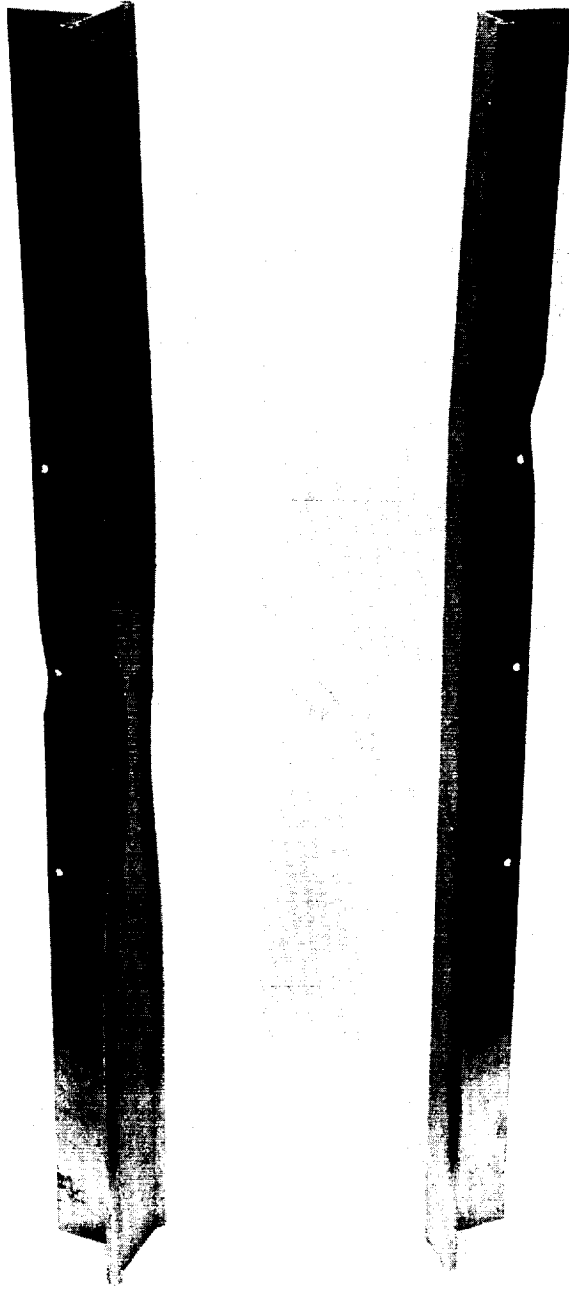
TYPICAL FAILURES FOR 24" "T" AND "L" SECTIONS SHOWING LOCAL FLANGE BUCKLING
